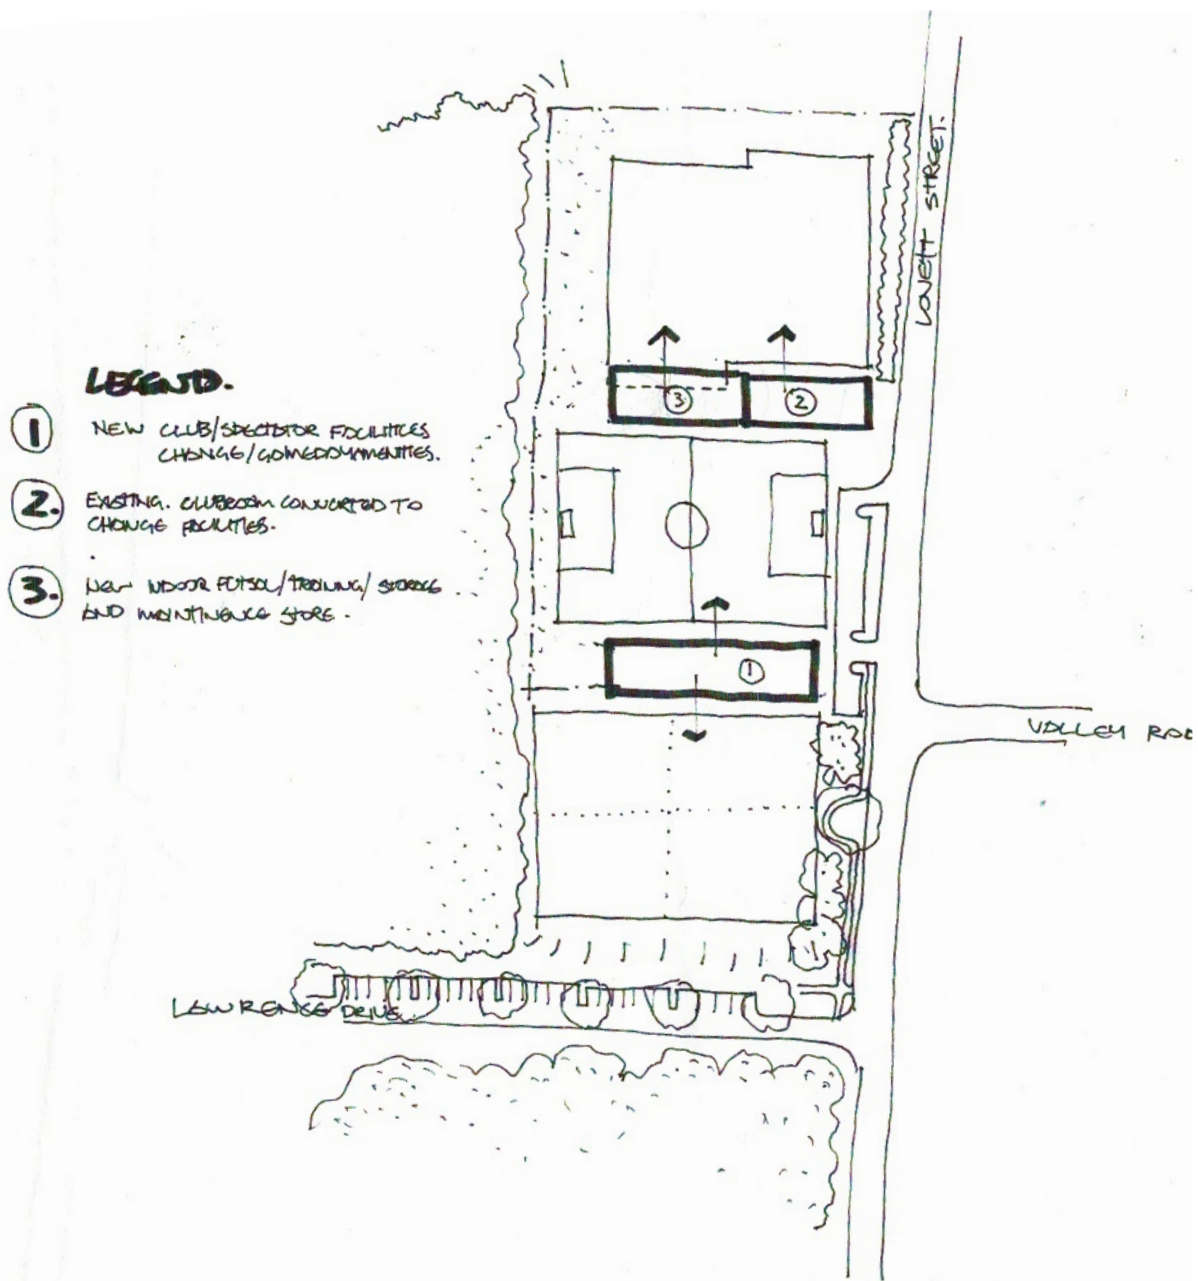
New pitch (north-south orientation) set back from Lovett Street with park facilities to the street
